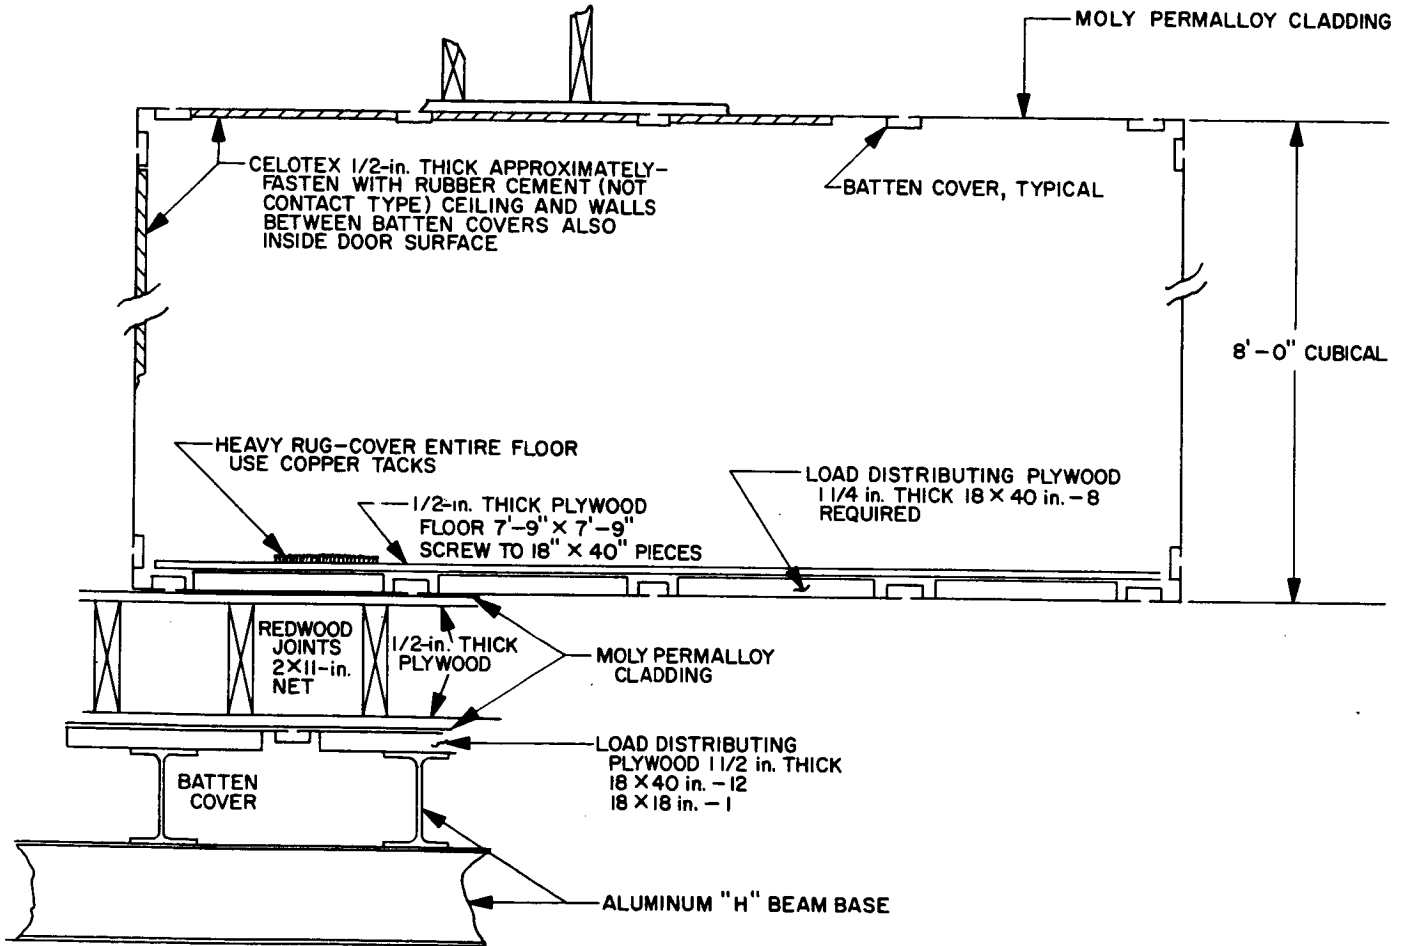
Section view through magnetic shield room showing inside walls and floor
